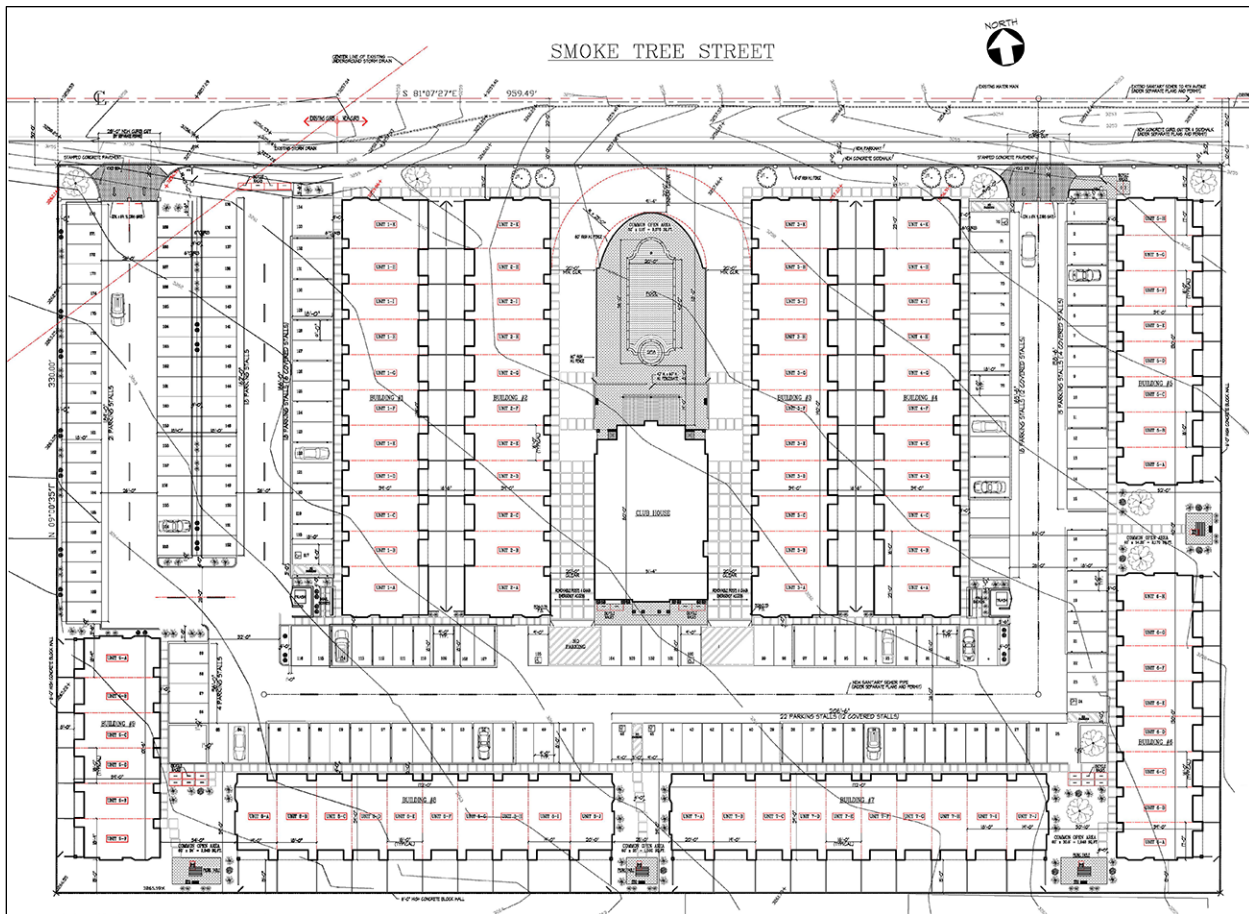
Site plan (adapted from figure provided by the client; original scale: 1"=20ft)
